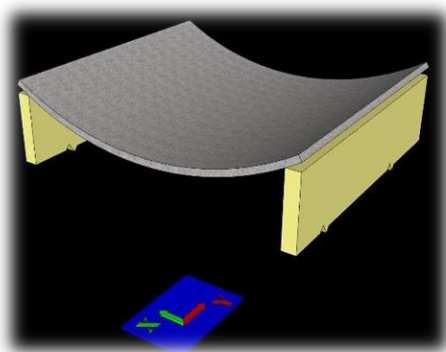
A one-way span, slab bends in one direction (Pratap, 2016)
